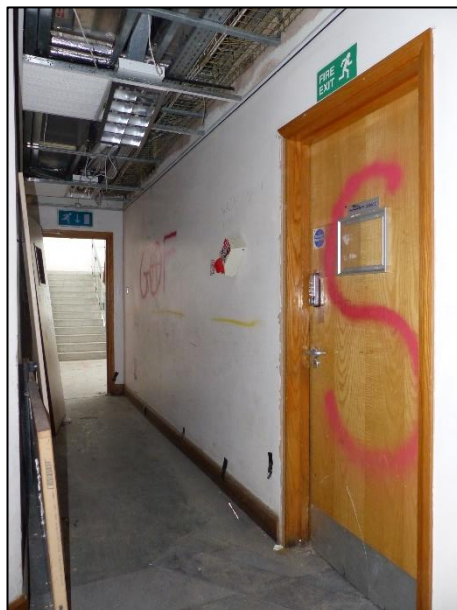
An example of the interview rooms/office to the west end of the high security section, looking south P1400175
